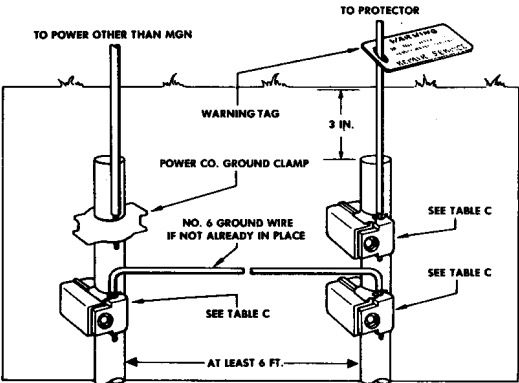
Power Other than MGN Grounded to Ground Rod—No Water Pipe
